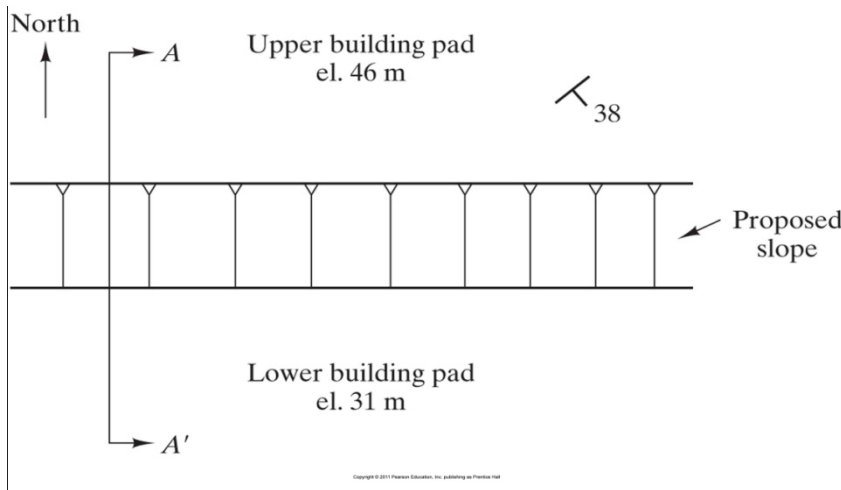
Plan view of proposed slope for Problem 2.9. el. = elevation.
